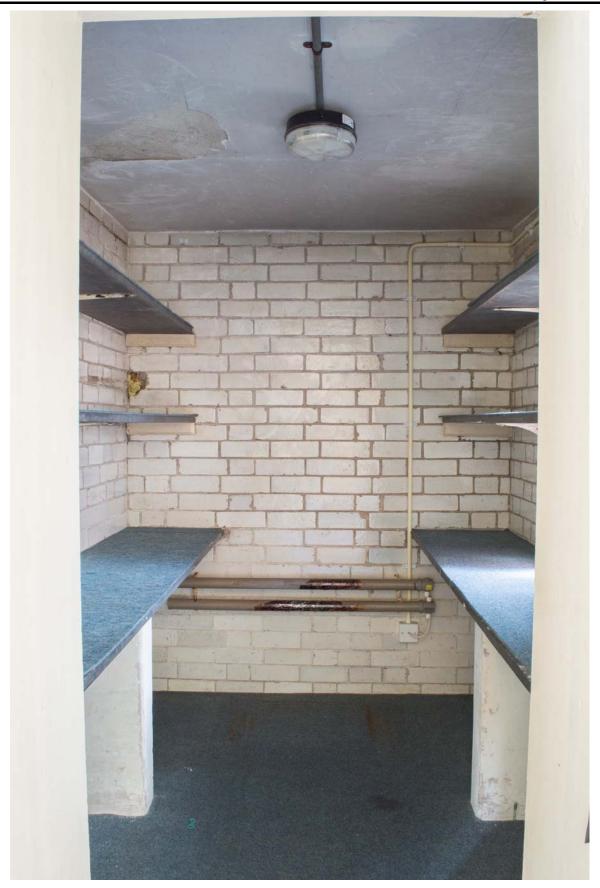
Building 20: commander's quarters, ground floor loving room. View looking south (SGA15-428)
